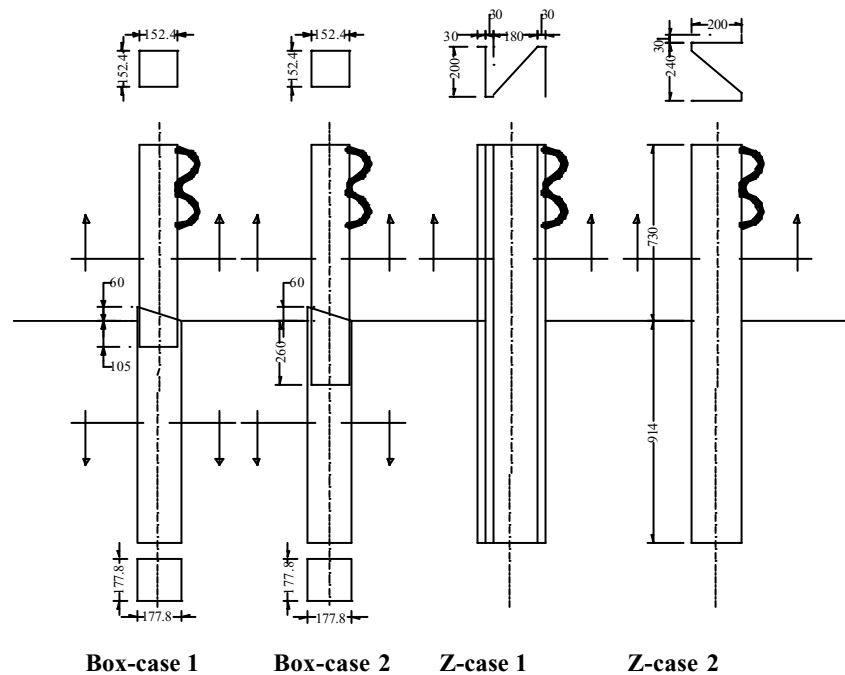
Layout of the box and Z-shape steel guardrail posts considered in this study
